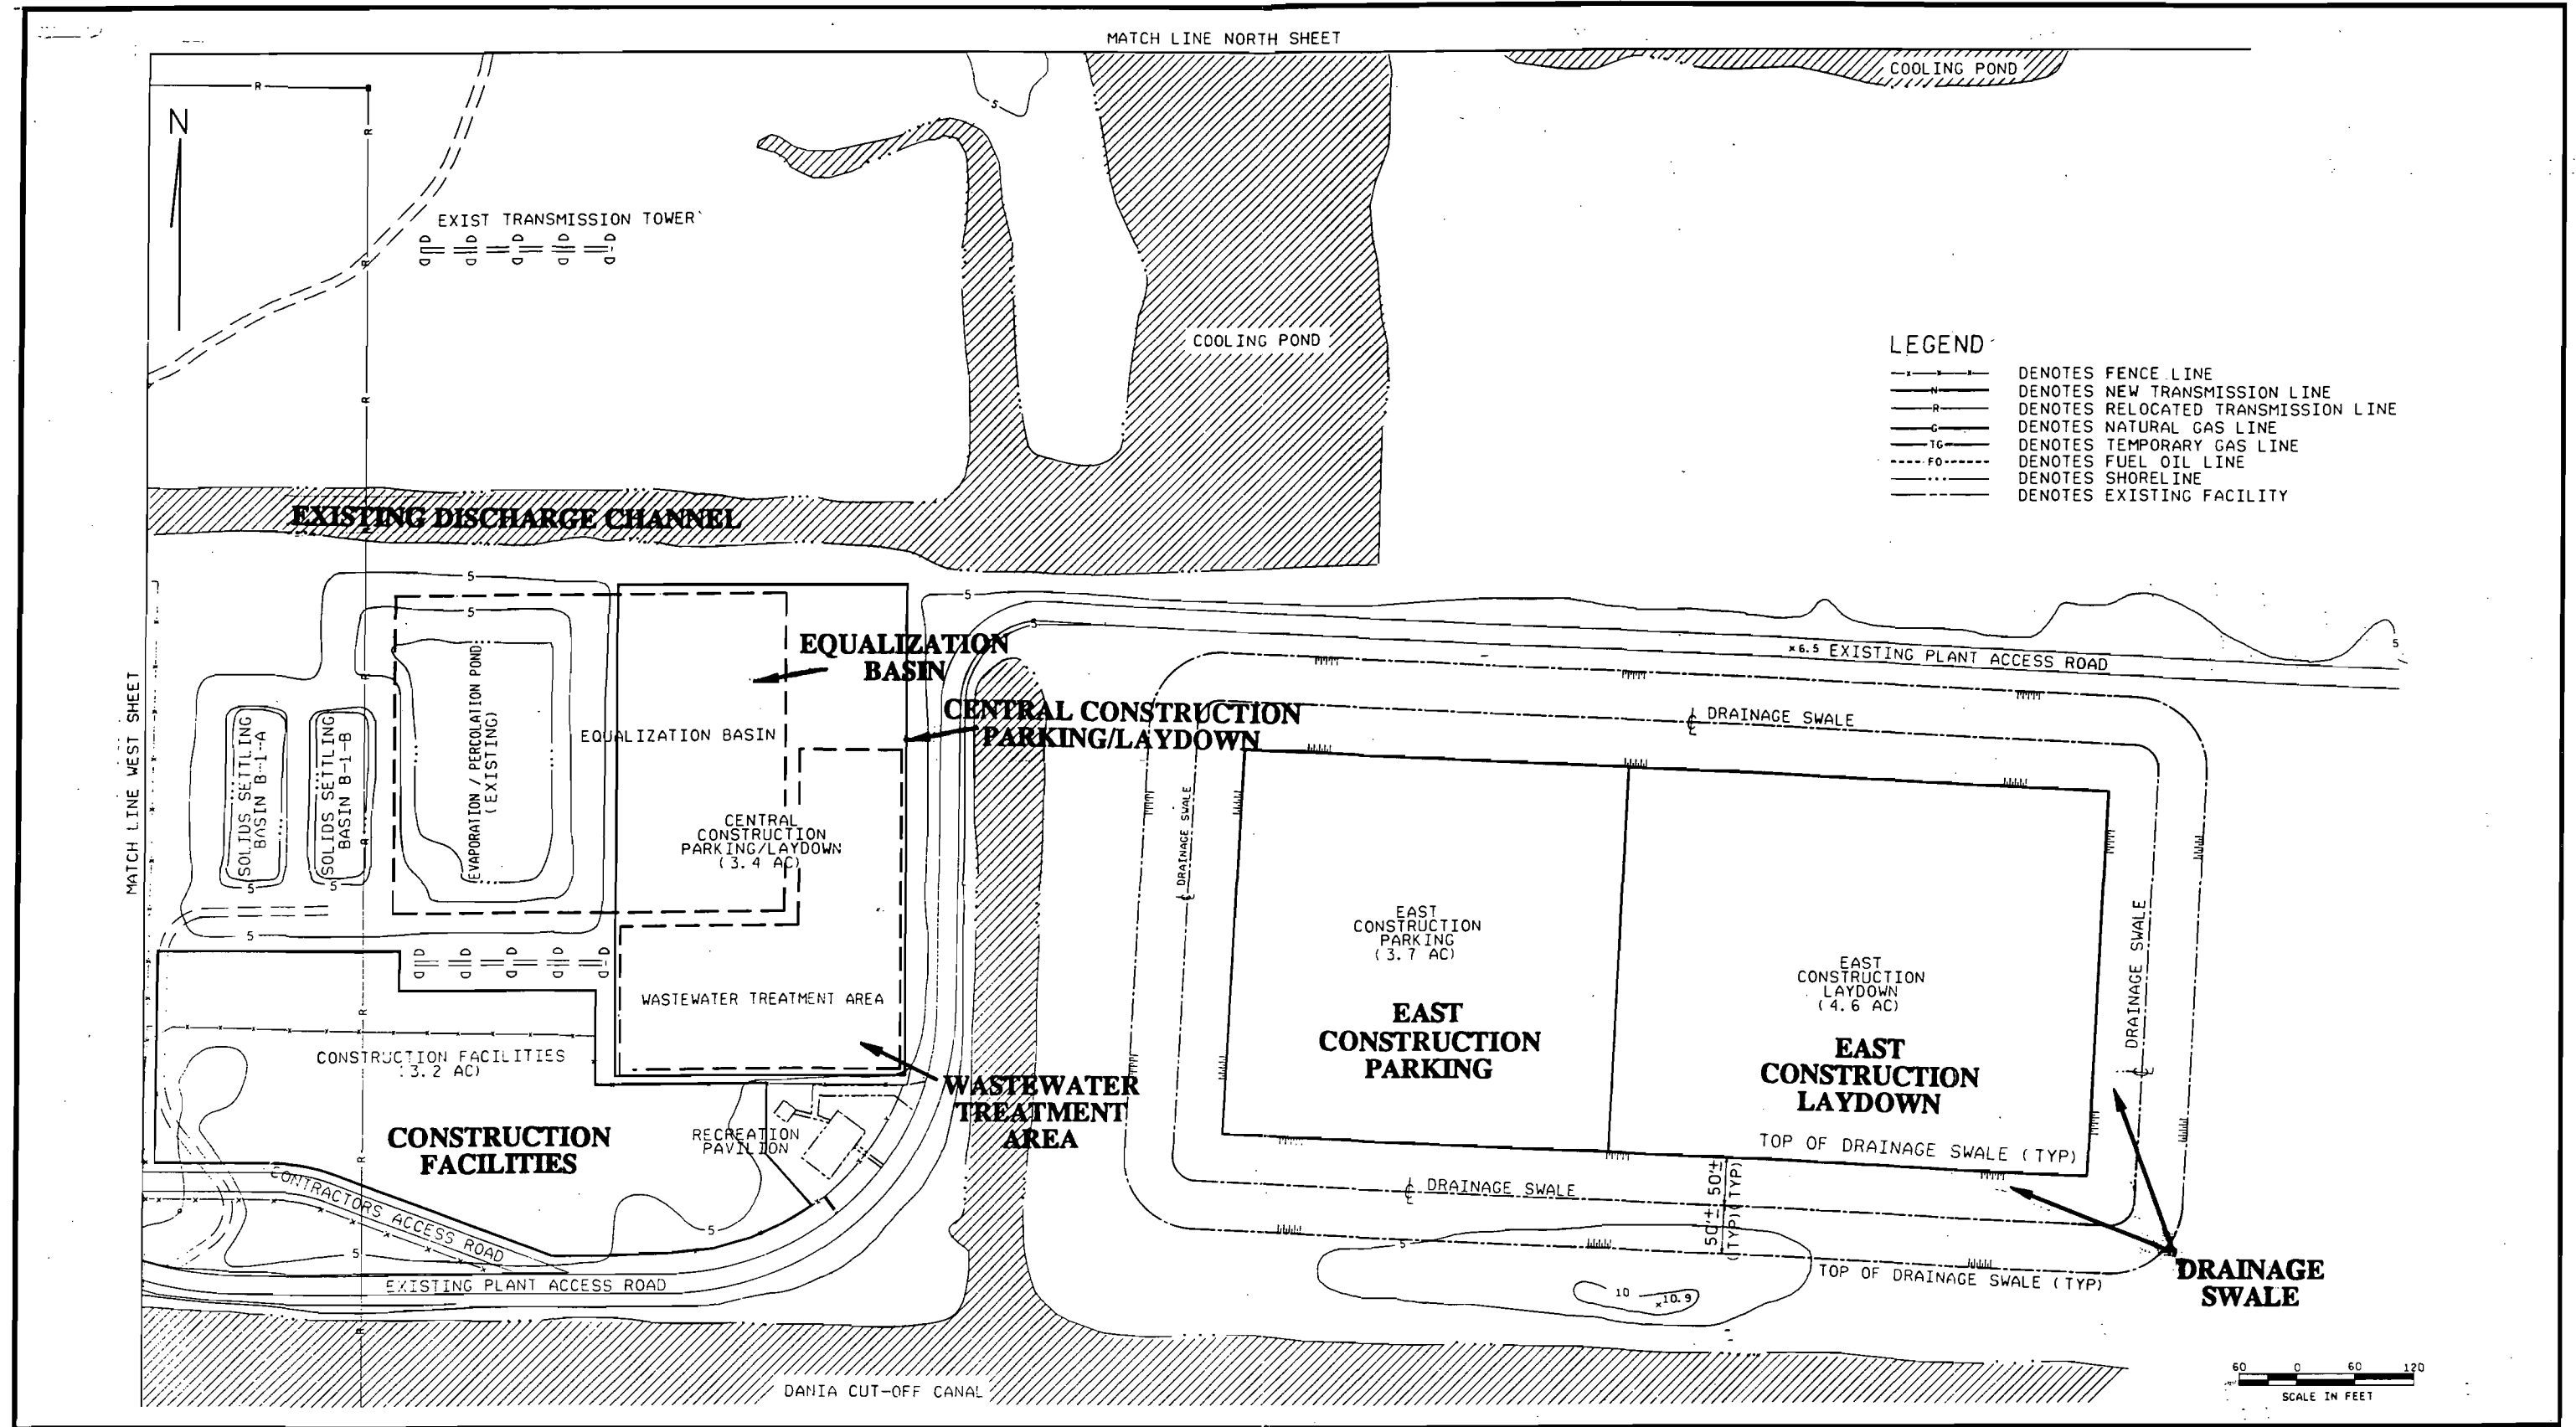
SITE DRAINAGE - EASTERN PORTION OF SITE
